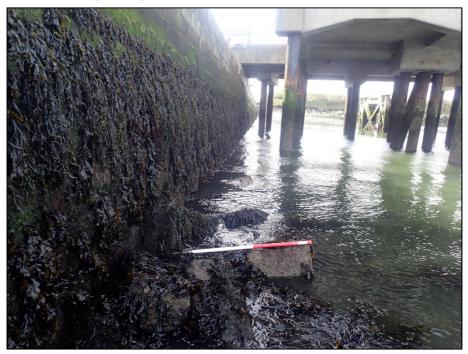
West-facing view along channel side of Feature F02, showing collapsed masonry from the pier-head access steps (RAS-02) in foreground and upstream Sludge Jetty in the background (1m scale).
